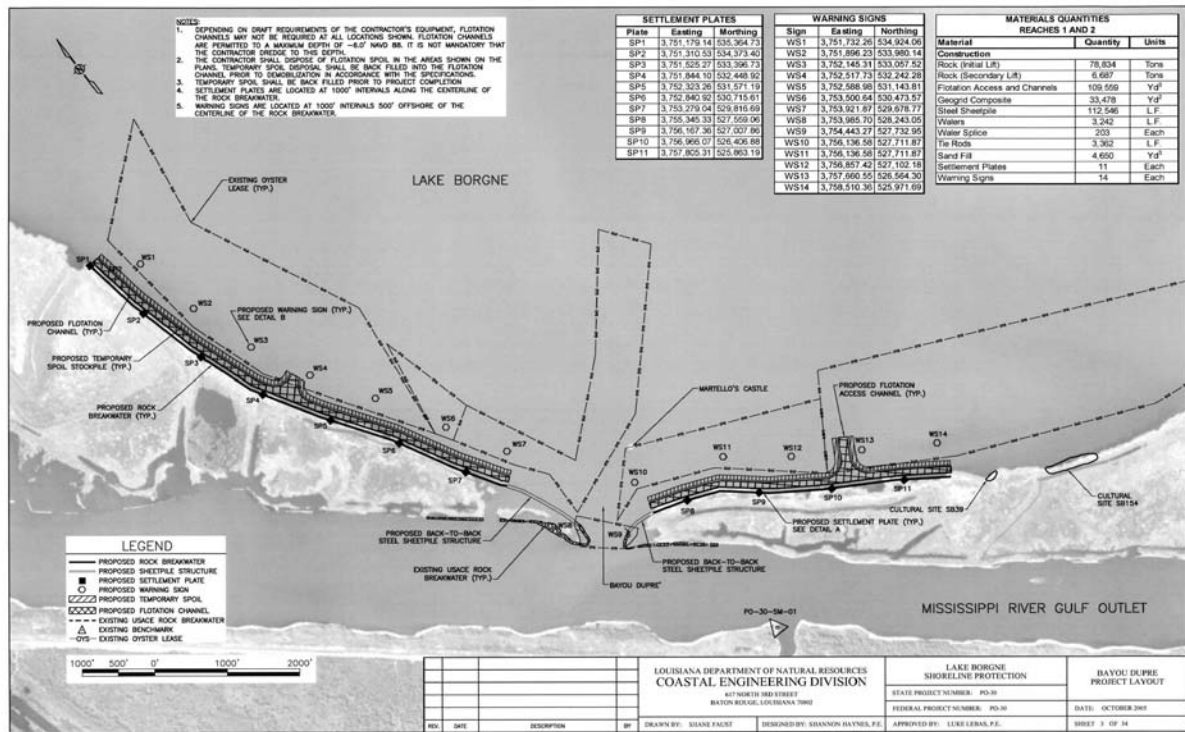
Bayou Dupre' Project Layout and Breakwater Alignment
